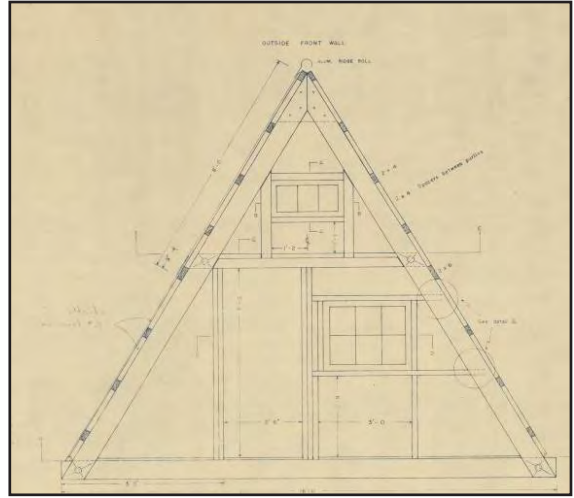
Front façade detail from cabin plan Hunter Cabin 'A' frame: ADFG: 1962.
